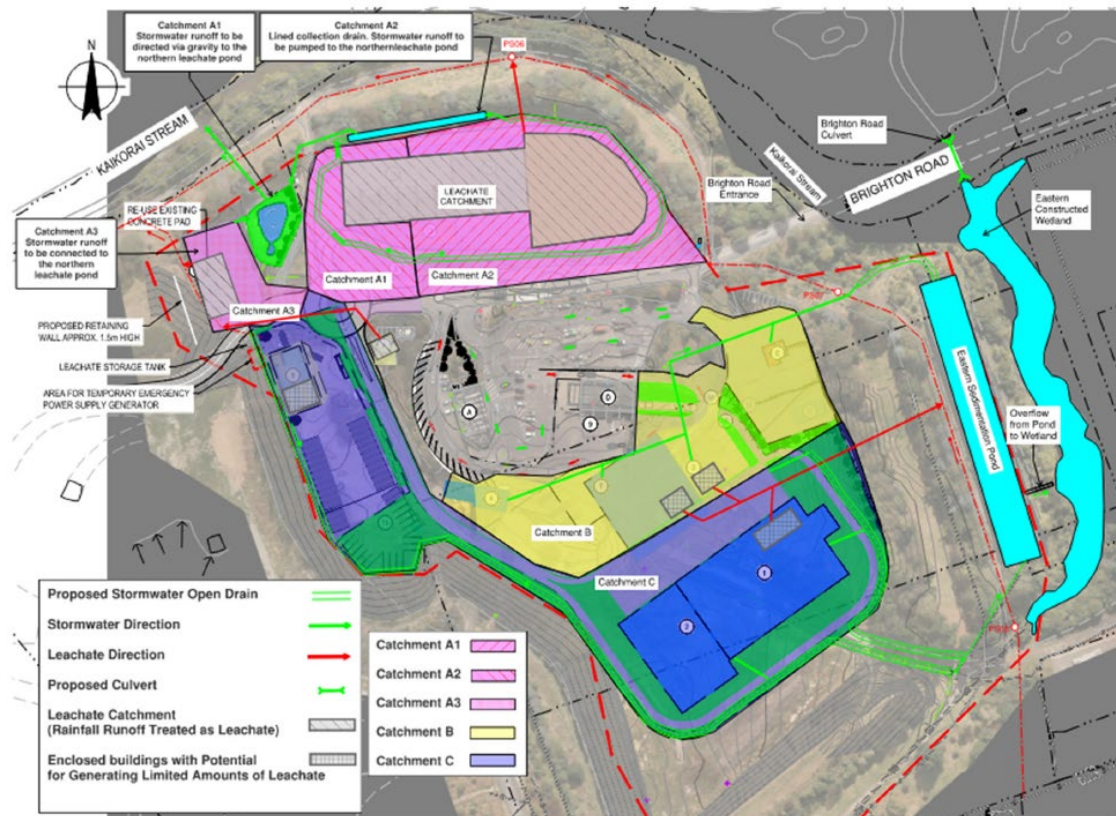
Proposed stormwater management plan for the RRPP including stormwater catchments. Source: Appendix 3 to RM24.143 application.
